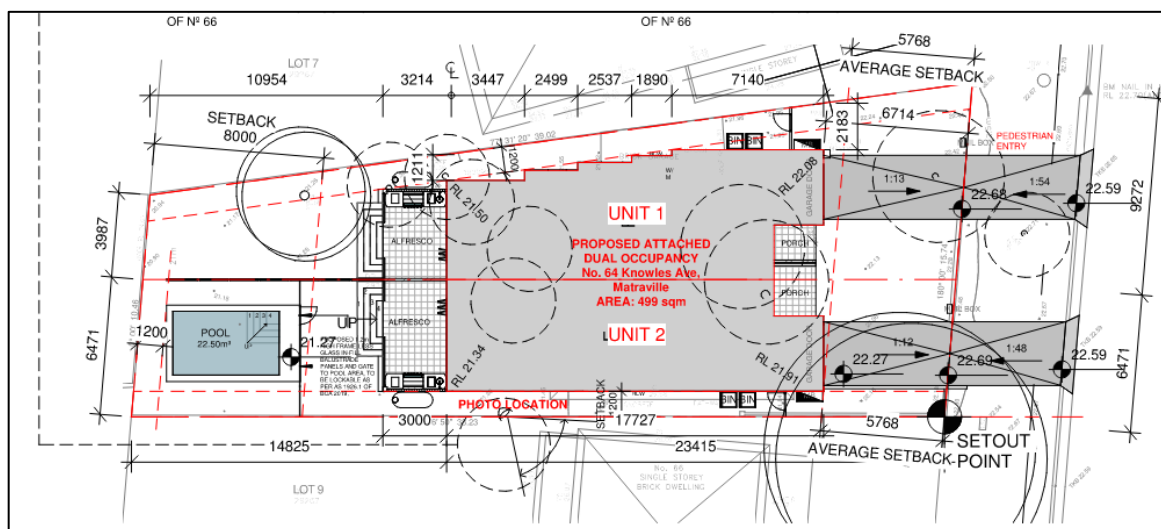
Approved Dual Occupancy Site Plan under DA/234/2020 – 64 Knowles Avenue
